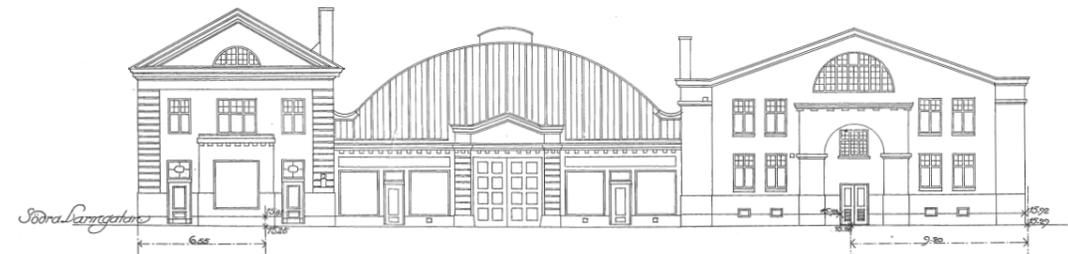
Building permit drawing from 1931. (Wallenstam, 2017. Retrieved with permission.)
